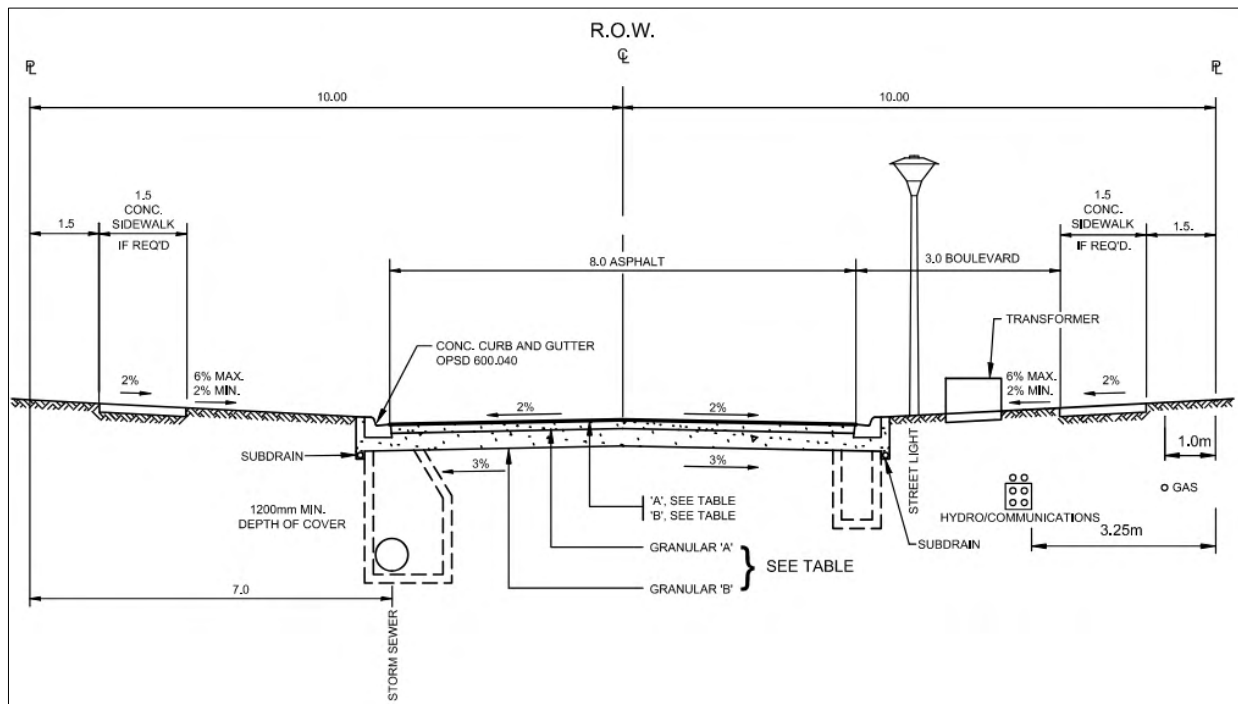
Township of Puslinch 20-metre Urban Cross-Section
